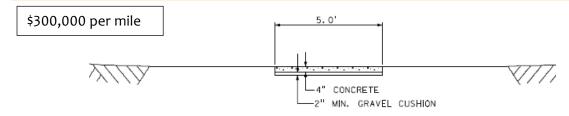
STANDARD SIDEWALK TYPICAL SECTION
